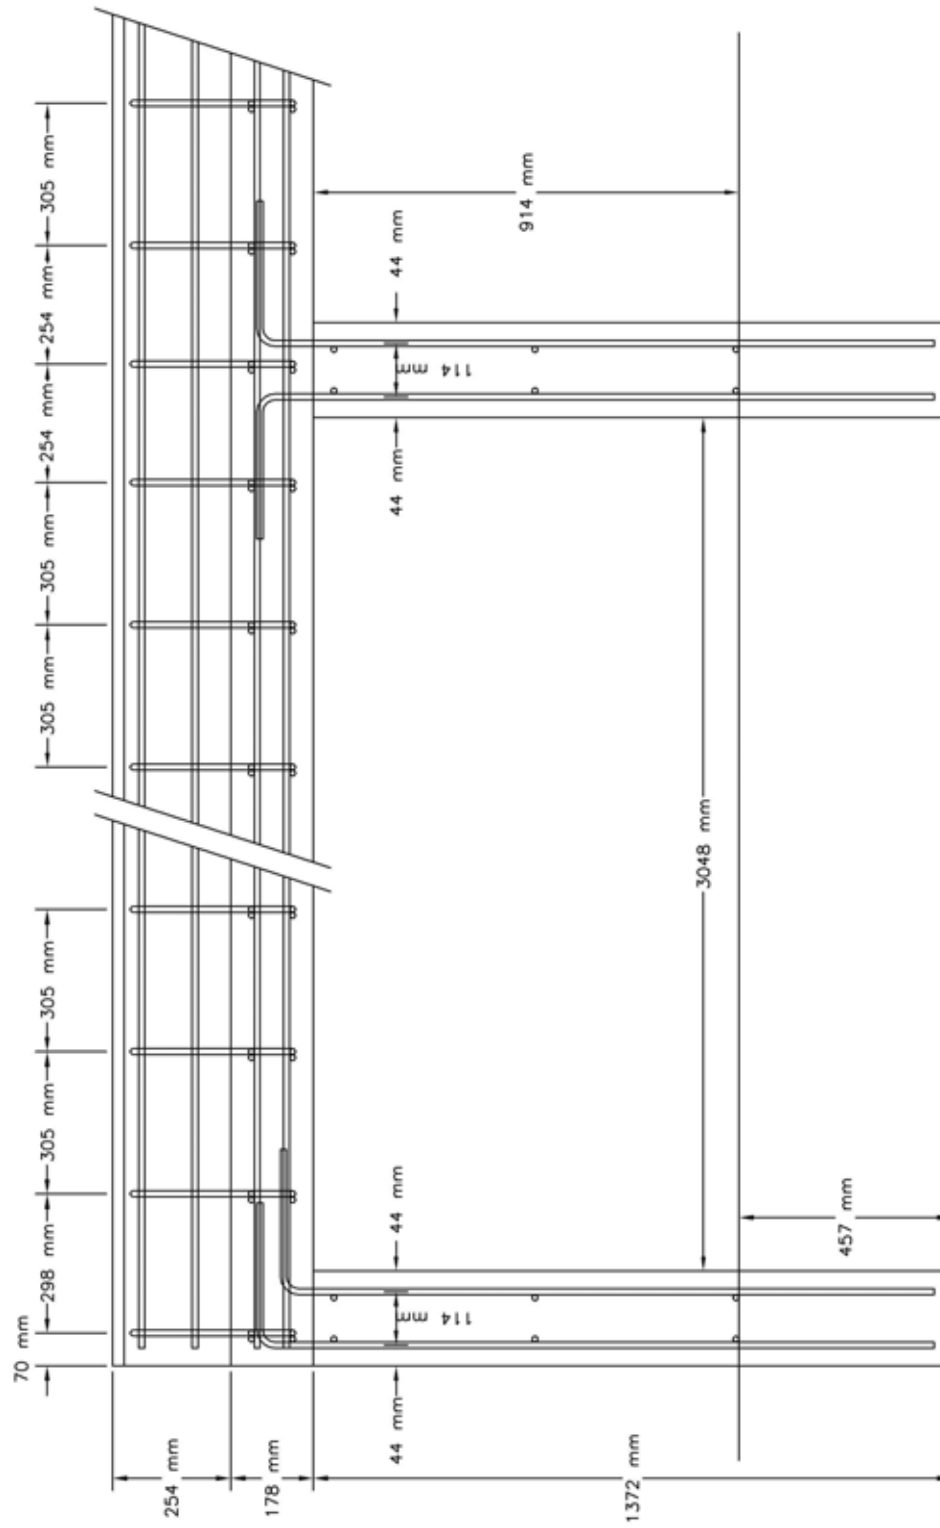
Concrete Culvert Top Slab and Curb Details - End View
